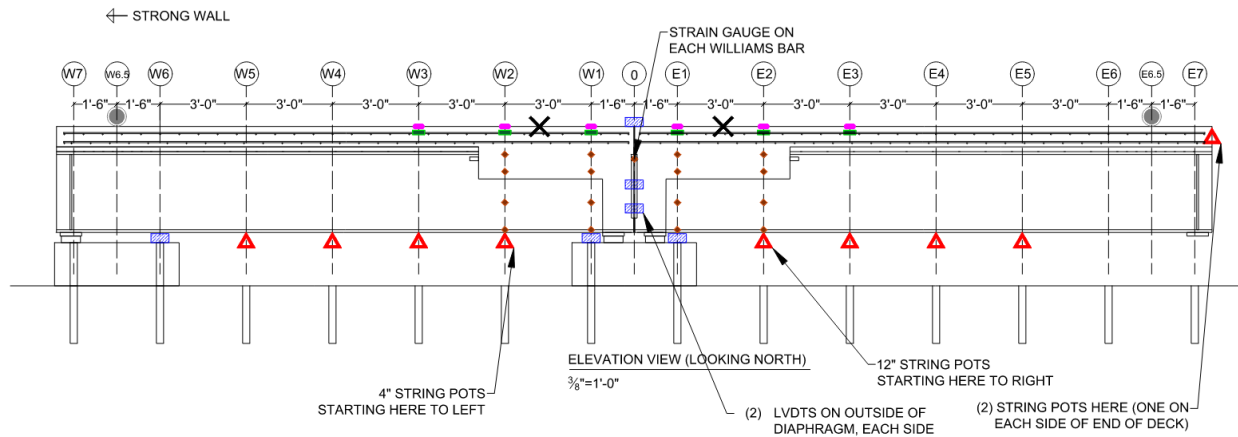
Concept D Instrumentation Plan (Elevation View).
